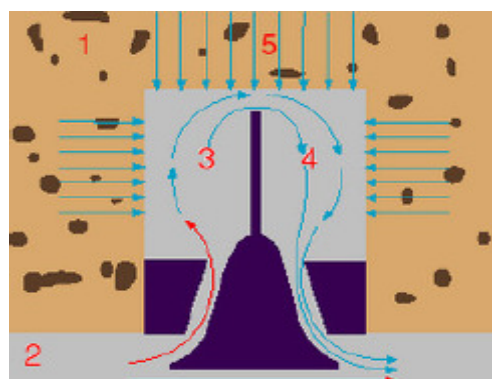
Single-brick wall Schrijver damp proofing system [60]
